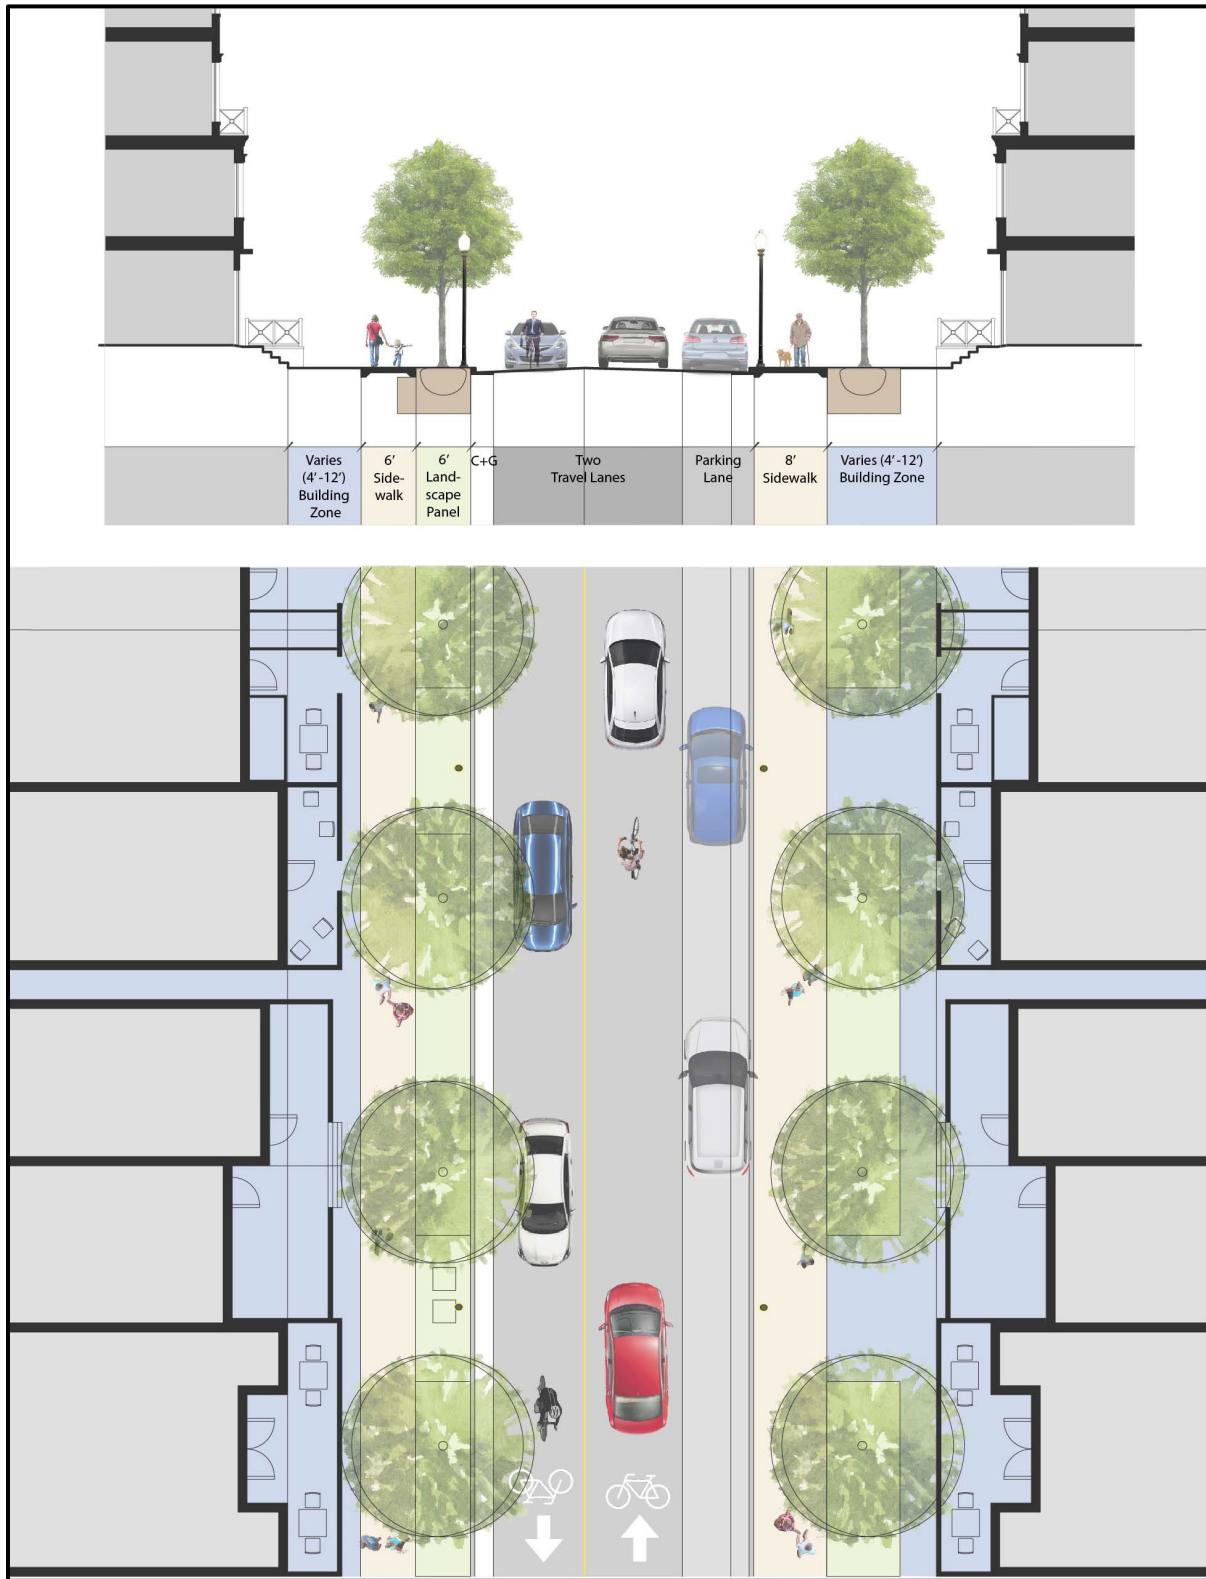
Other streets and new streets (Local Streets Type 2) cross-section
